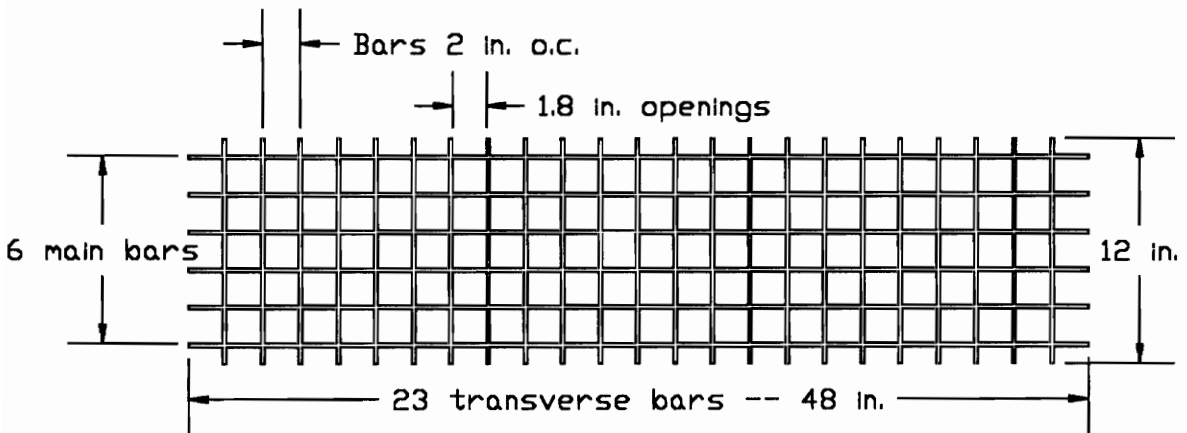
Bar Layout for Multigrig Reinforced Beams
